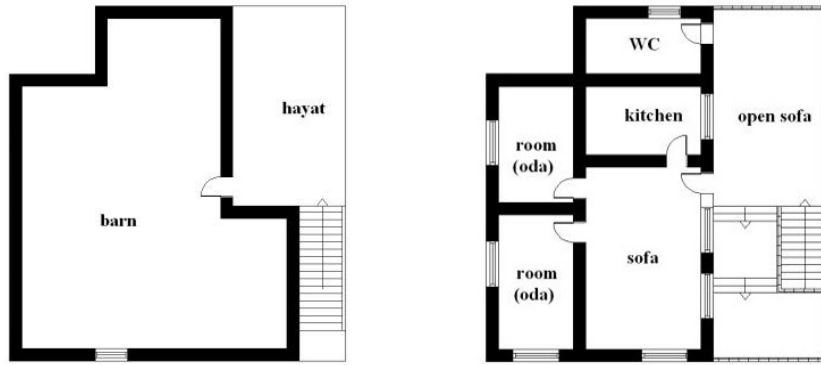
Ground and first floor plans of case-I: the Ahmet Sivri House (Drawings by Author, 2011).
